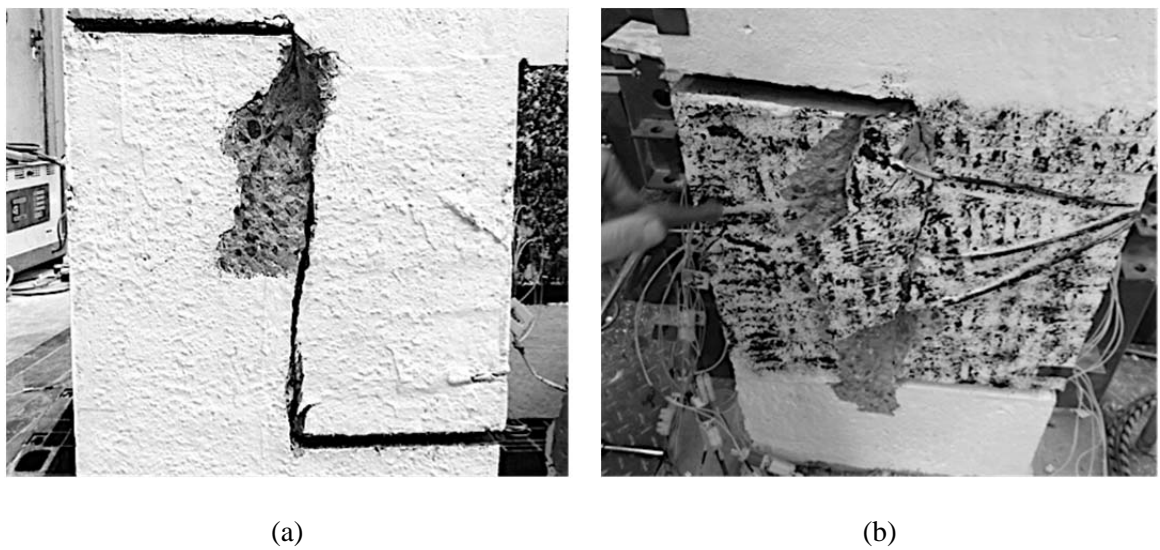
Failure modes of deep embedment push-off specimens: (a) specimen D2B2, (b) specimen D2B3.
